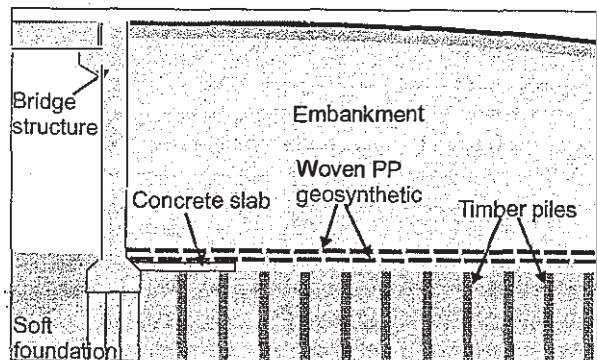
Toa Payoh overpass piled embankment, Singapore, 1984.
